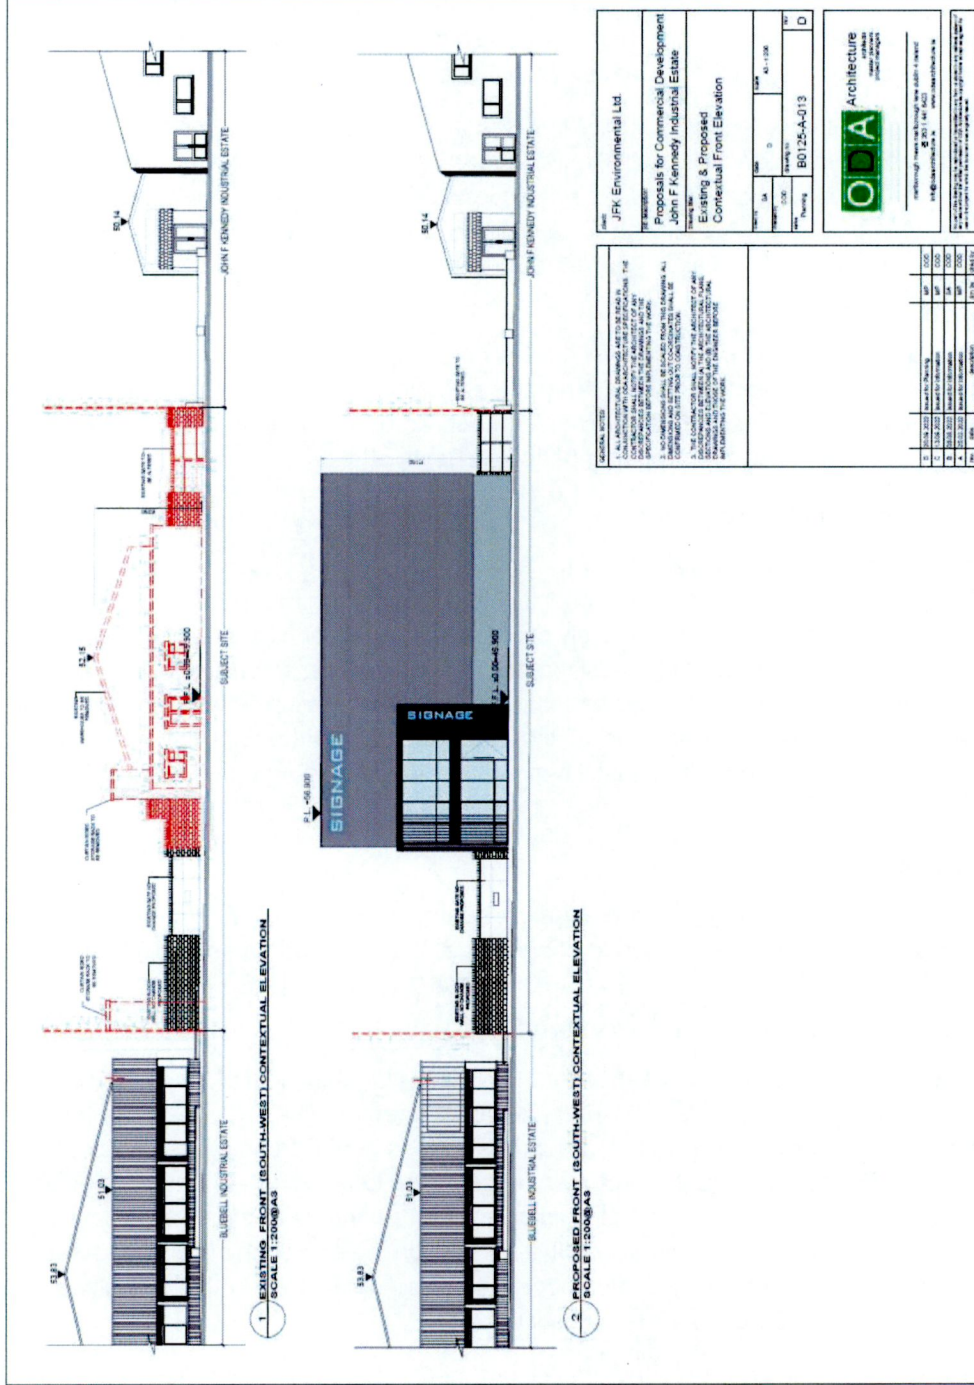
EXISTING AND PROPOSED CONTEXTUAL FRONT ELEVATION (ODA ARCHITECTURE)
